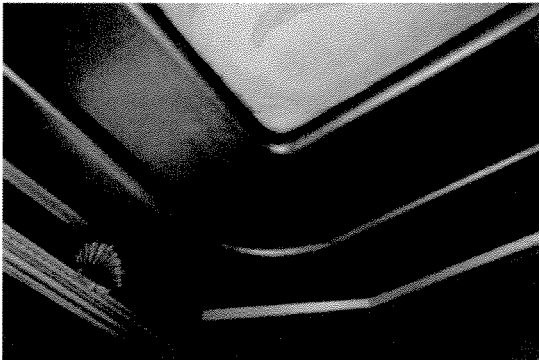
The rounded-corner, stepped ceiling molding was in place as early as 1954.
